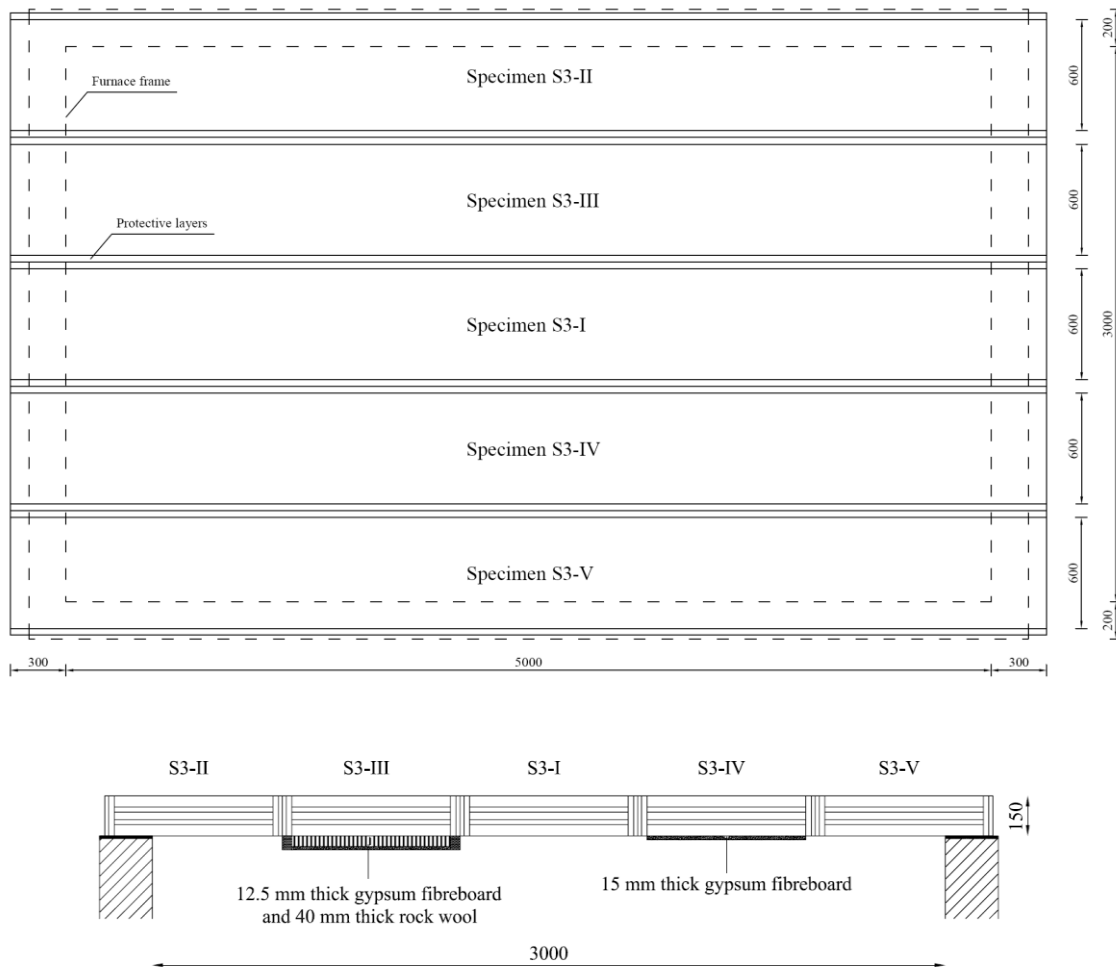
Plane view of setup for large-scale fire tests No. 1 and 2 (dimensions in mm).
